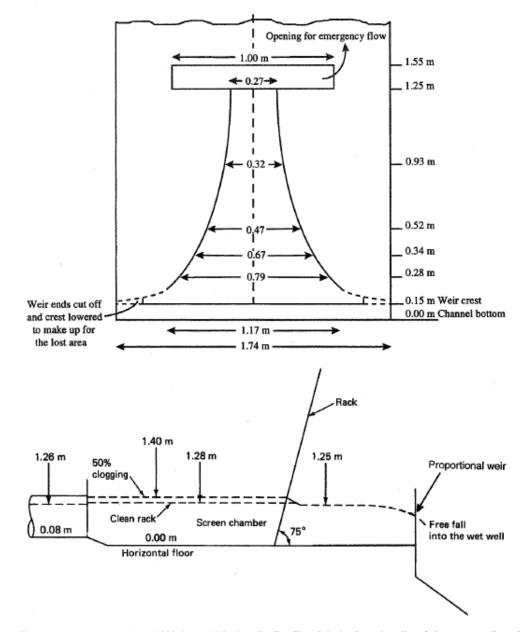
Proportional Weir and Hydraulic Profile: (a) design details of the proportional weir and (b) hydraulic profile through the bar rack at peak design flow when rack is clean and at 50 percent clogging. All Elevations Are with Respect to the Datum at the Floor of the Rack Chamber.
